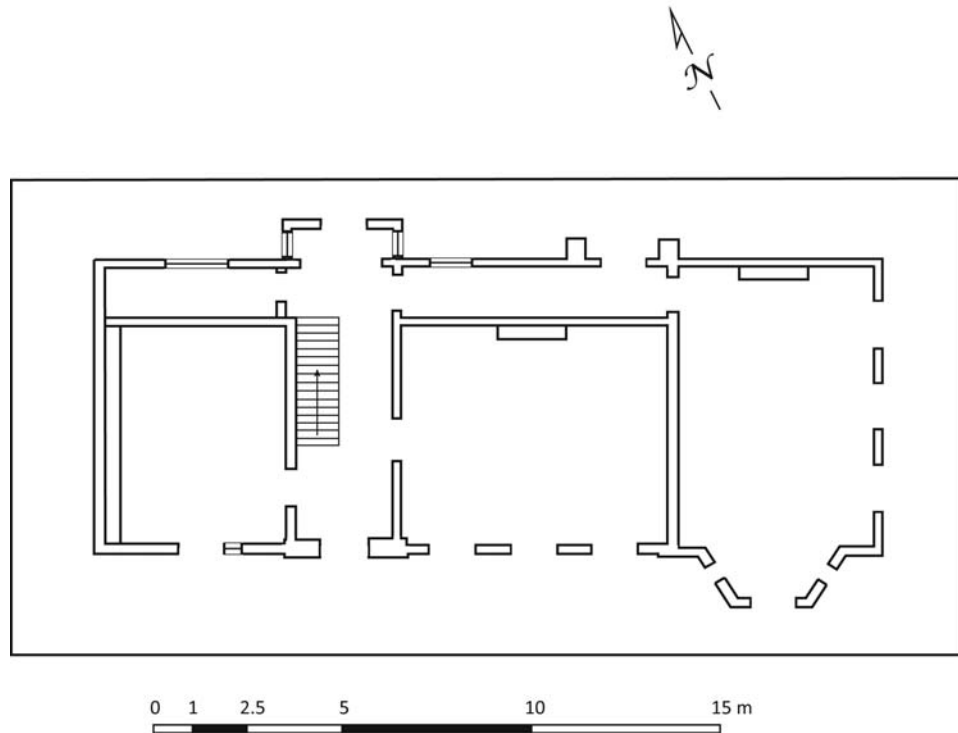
Ground floor plan of Bishop Hale's House (F. Bush)
